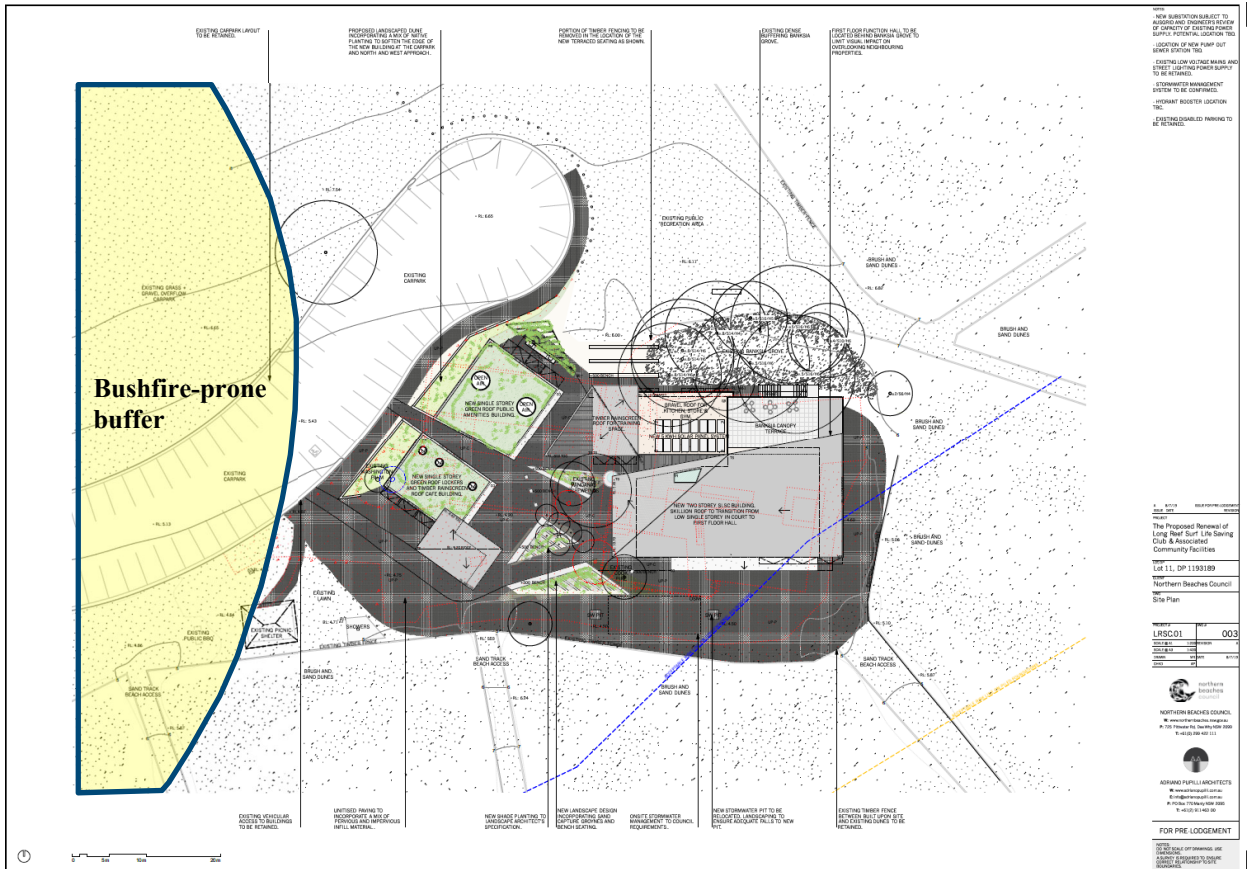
Site plan for Long Reef SLSC renewal project outside bushfire buffer zone
